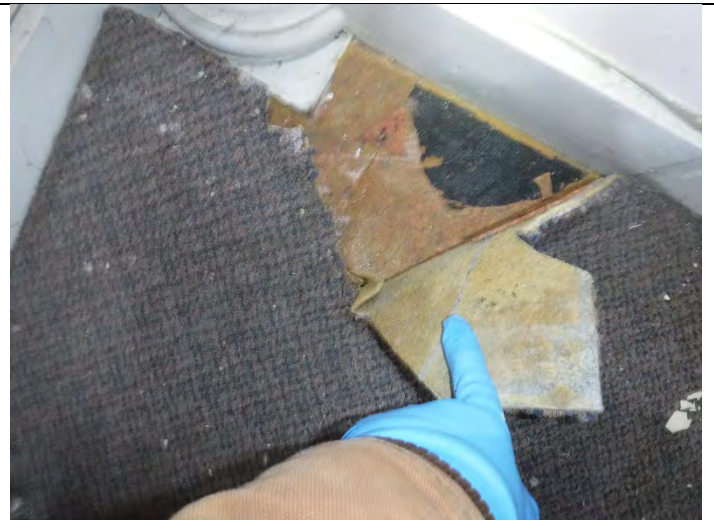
(12-16-2021): Example of an area with 9-inch floor tiles discovered beneath flooring/carpet. North Wing – Sections II and III.
